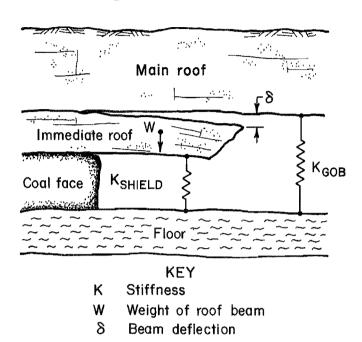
Cantilevered beam deflections of immediate roof structure.
